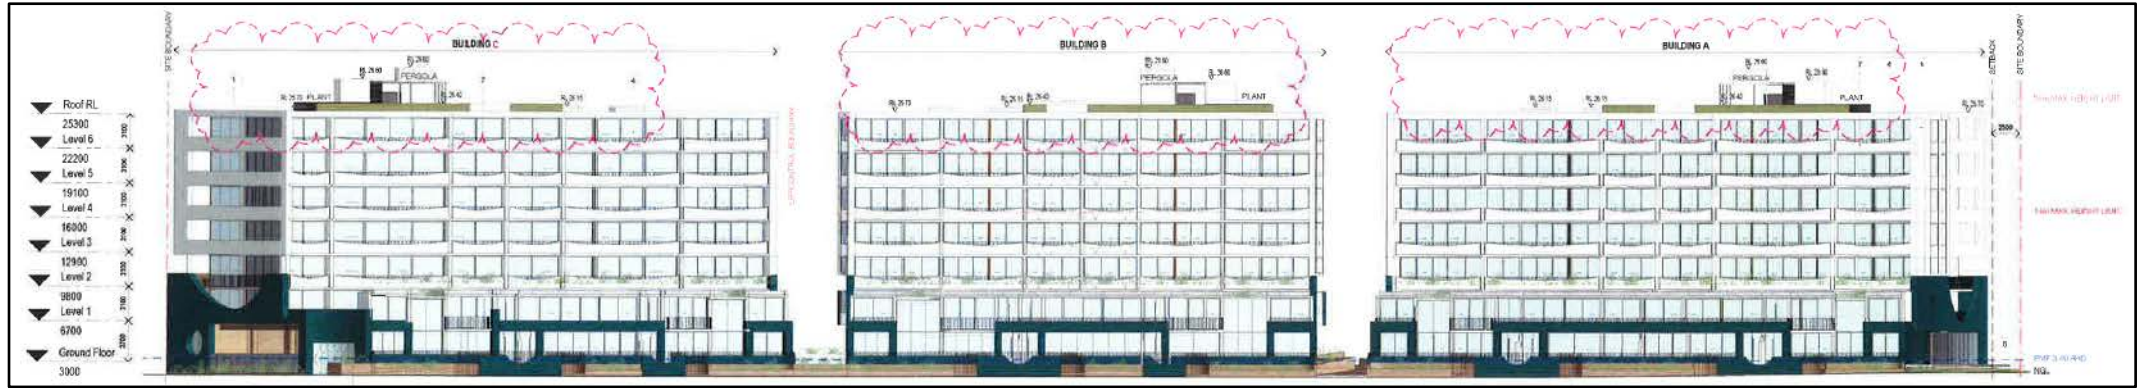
| Approved Northern Elevation Plan (Source: DA-0501 Revision 13 dated 27.11.17). Note: SSD Approval Condition B2 requires the rooftop area and associated elements on Building C to be removed.
